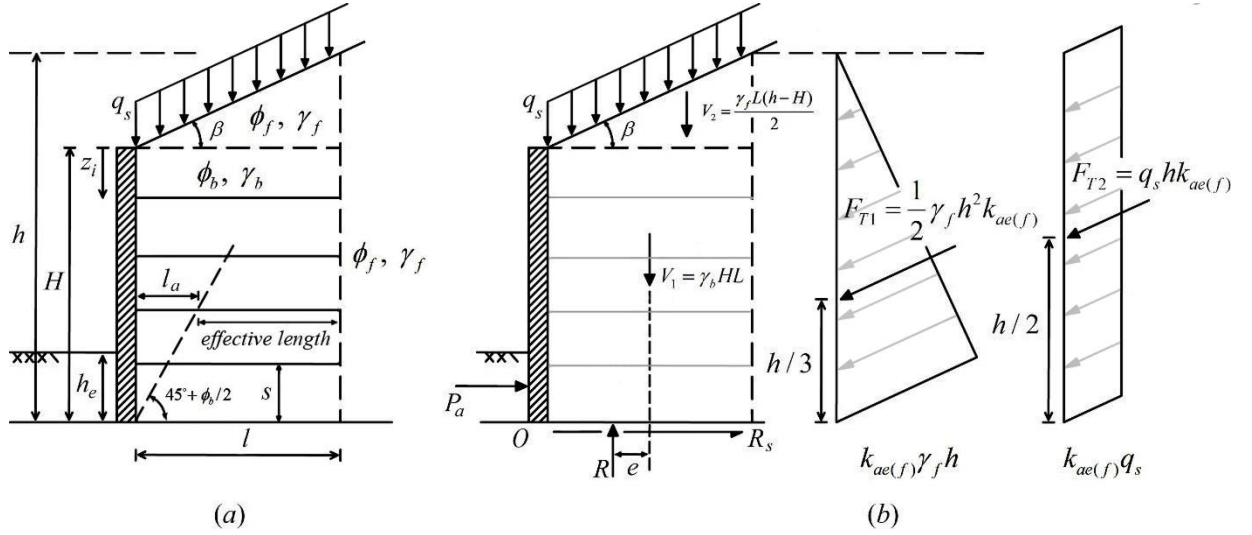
(a) Parameters used in different steps of the design; (b) external forces considered for the Geosynthetic reinforced retaining wall system.
